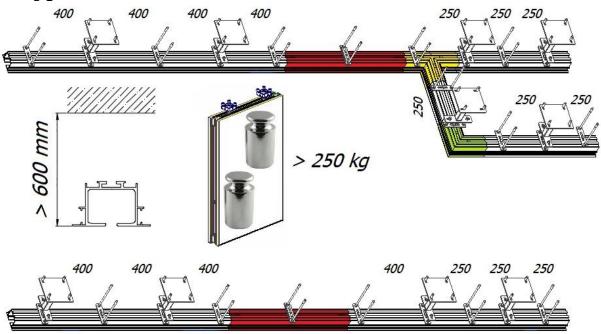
Location of track fasteners for panel weight over 250 kg and distance from track to ceiling greater than 600 mm
